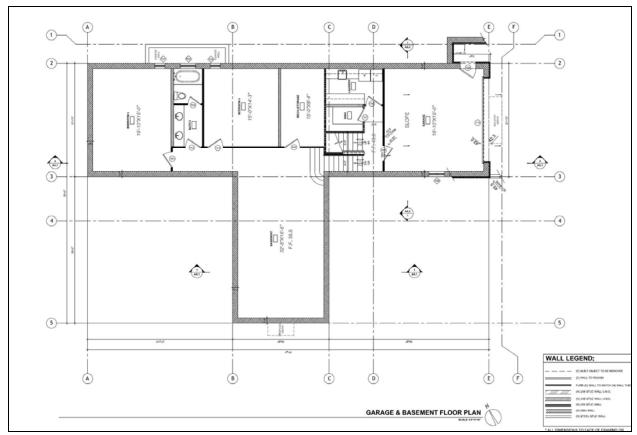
Floor Plan: Proposed Garage and Basement Floor Plan at 26338 Valley View Avenue.
